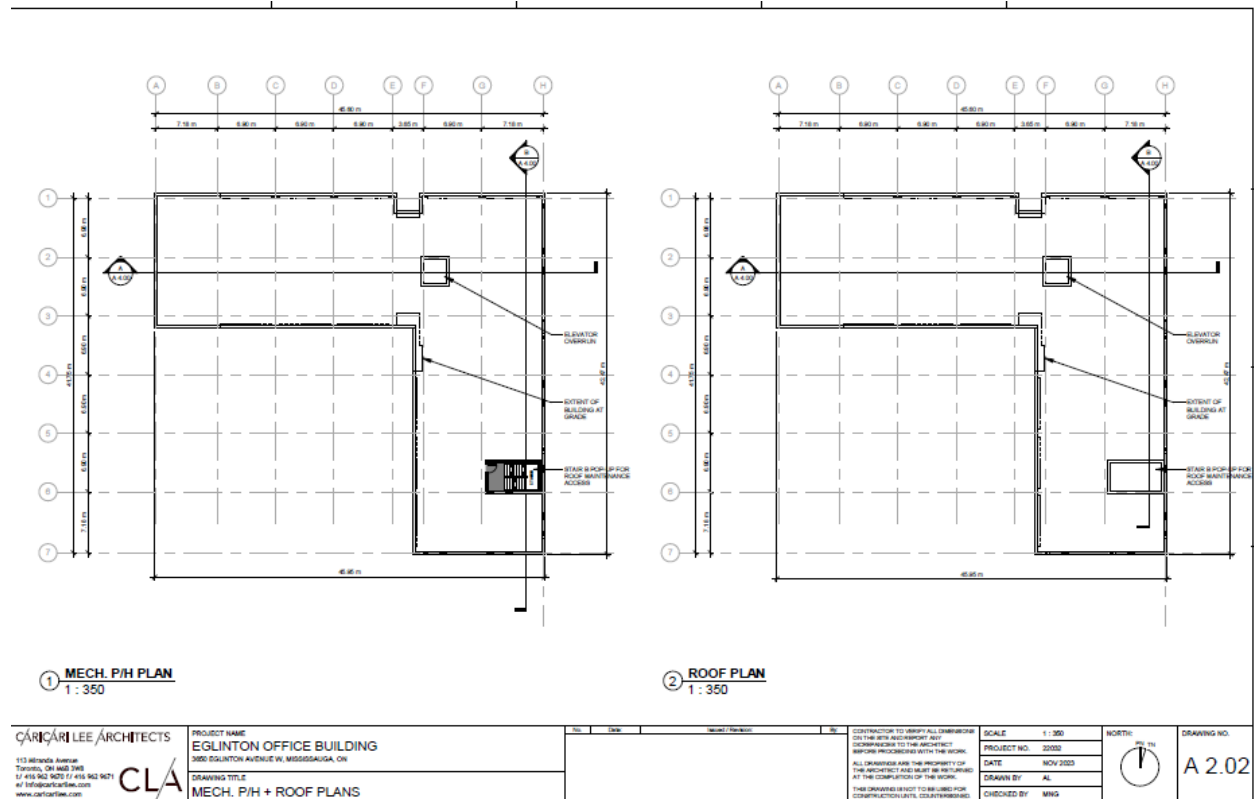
Roof Plan. (Plan from owner, November 2023.)
